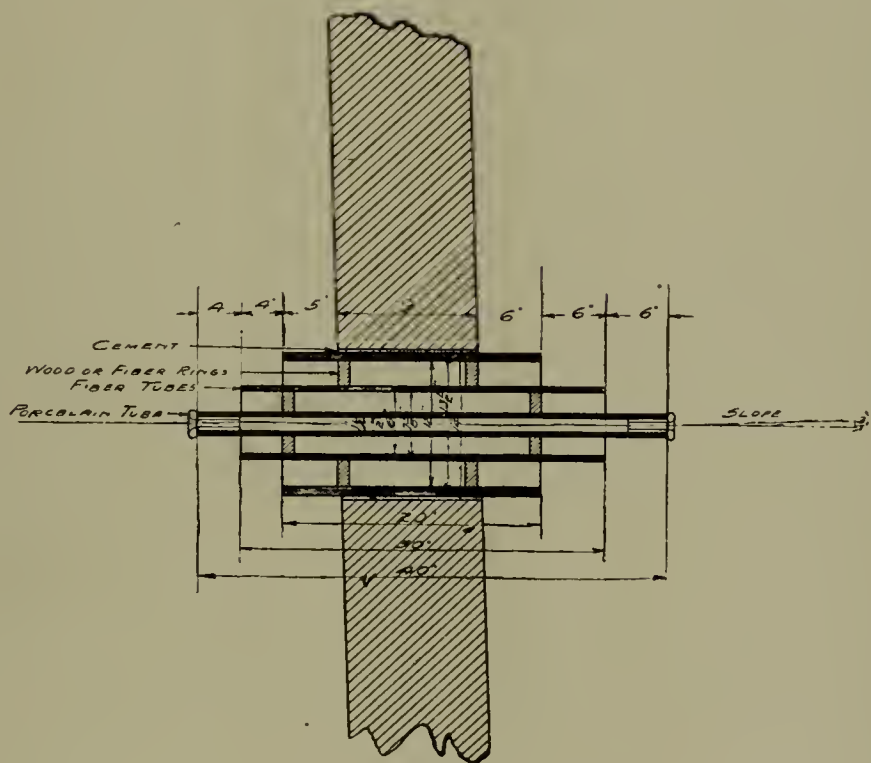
HIGH-TENSION WALL INSULATOR IN SUBSTATIONS.
